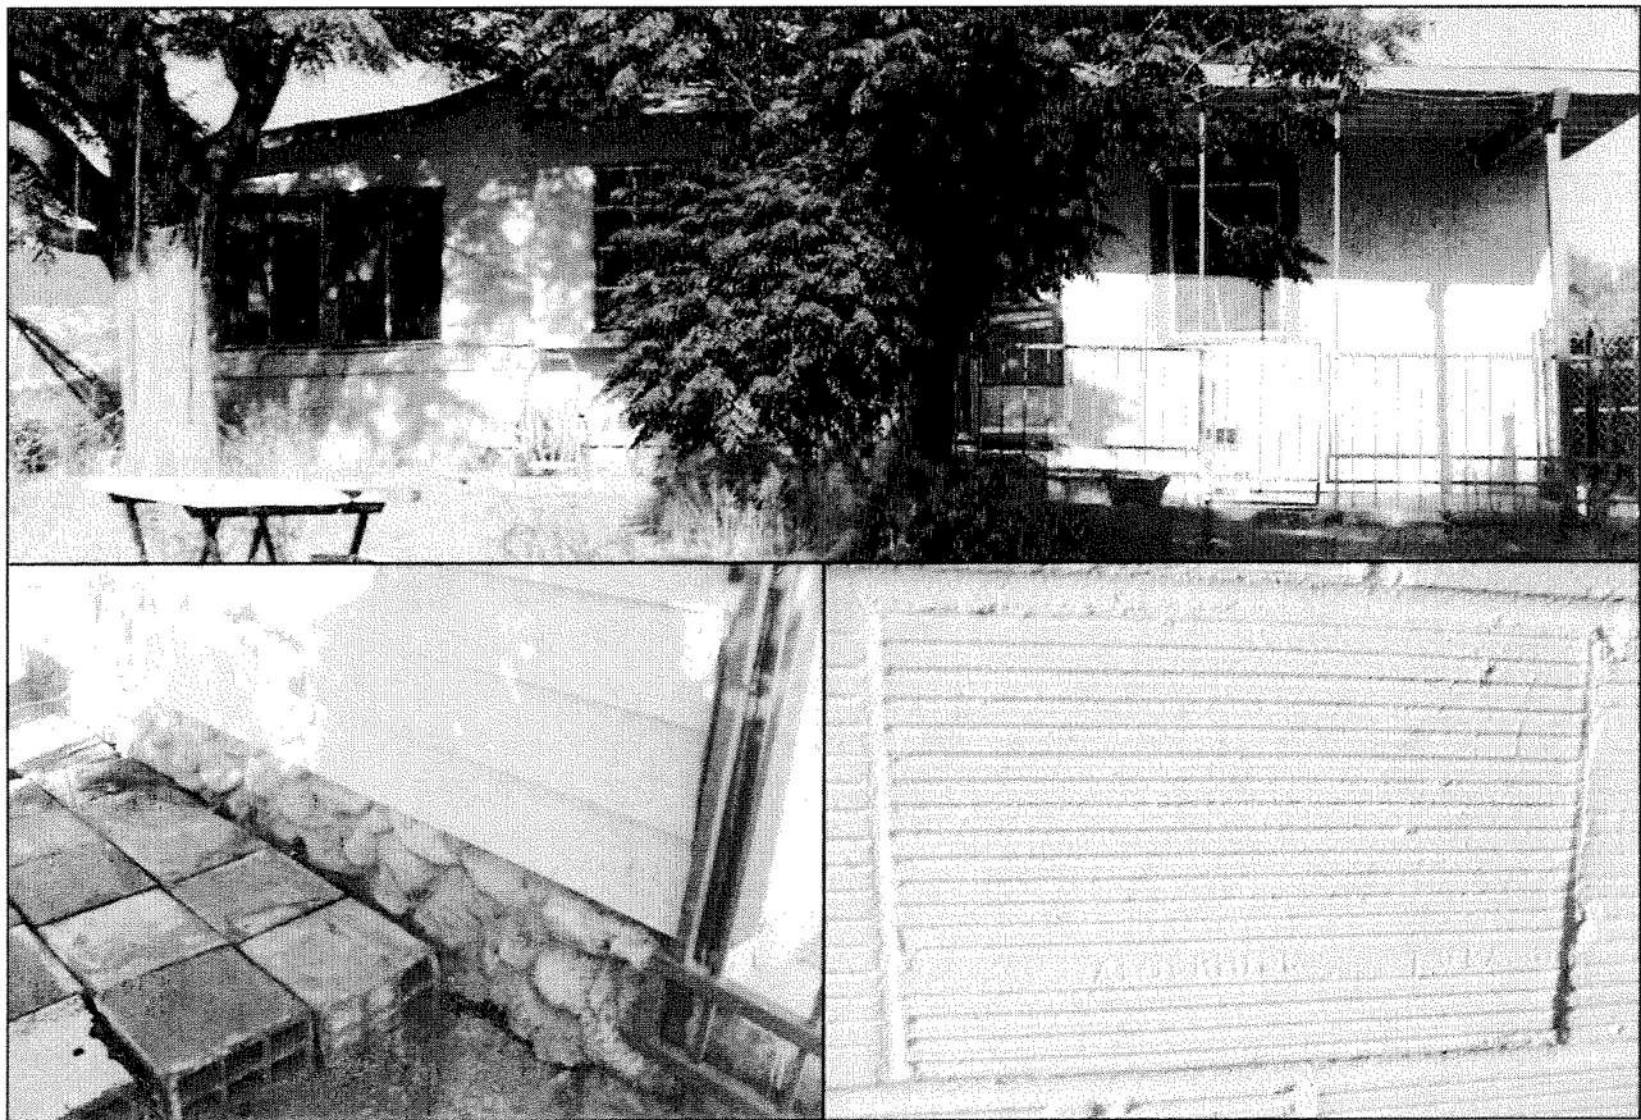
Historic-period residence at 28915 Lake Street. *Clockwise from top:* primary façade, view to the west; detail of "Alberhill LABCP Co" blocks; stone footing at the middle of the primary façade.
